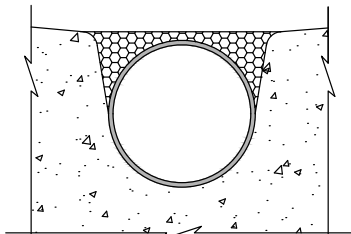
H: PLACE FORMWORK AND THEN CONCRETE
